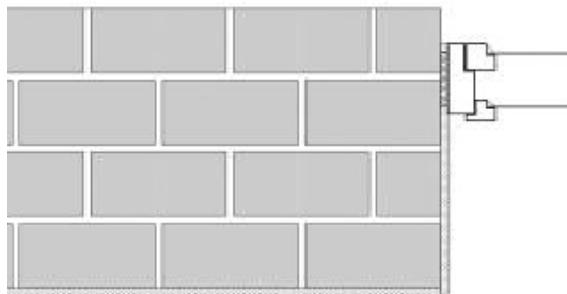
Horizontal section of the joint between the loadbearing exterior wall and the window.
